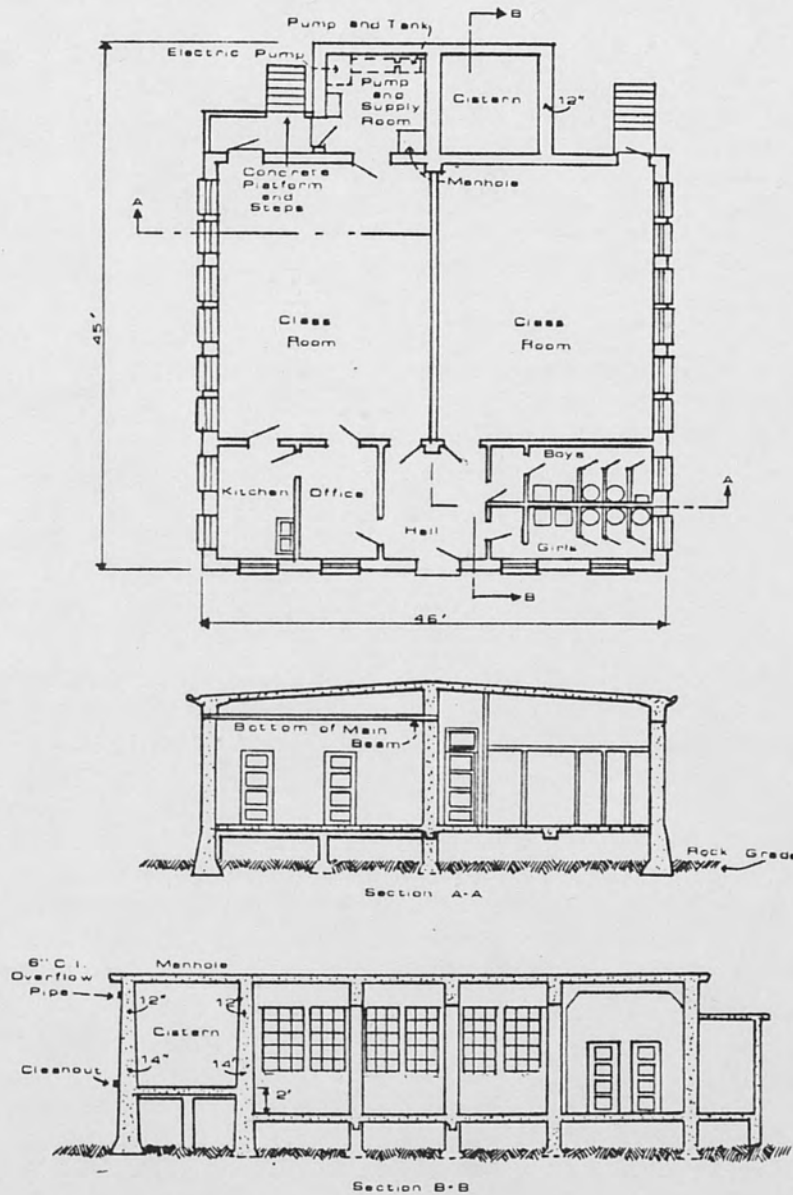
Florida hurricane shelter. (Redrawn and adapted from "Hurricane Shelters in Florida" 1938)
